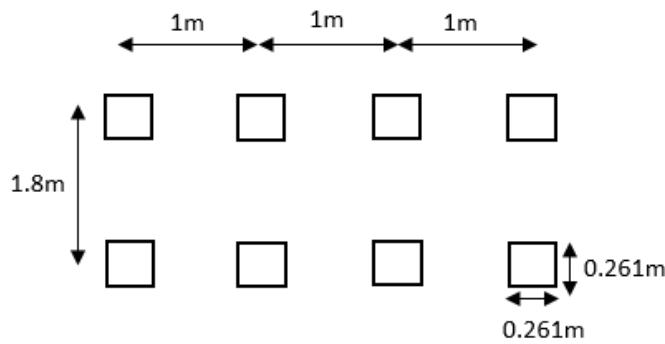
Wheel arrangement of HB vehicle that load transfer on to culvert
